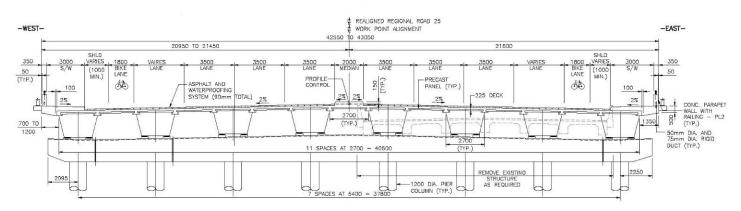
Cross Section of Regional Road 25/Highway 401 Structure
